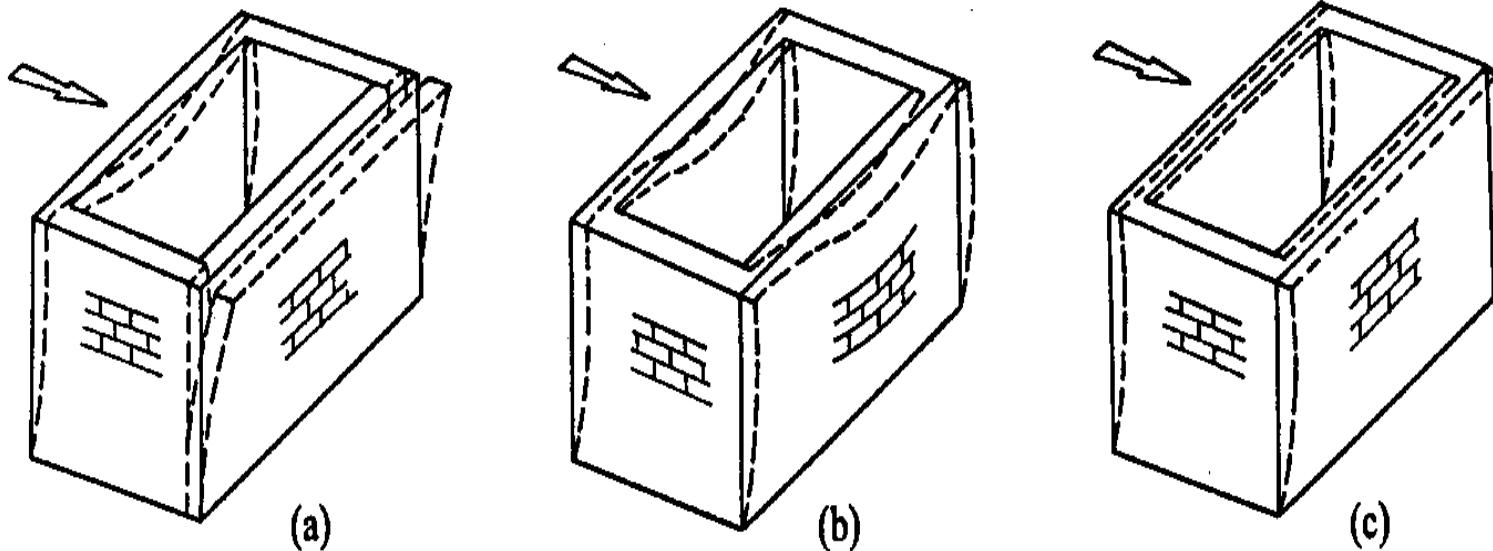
Vibration of masonry buildings during earthquake. (a) Building with wooden floors without ties,
